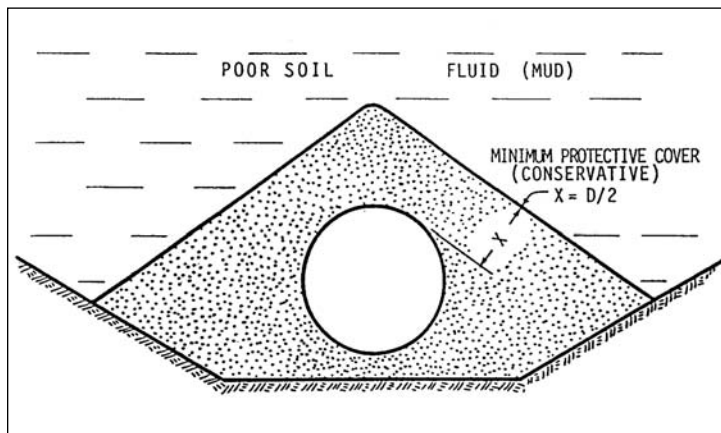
Minimum cover of embedment over a pipe in either an embankment or a trench with sloping walls.
